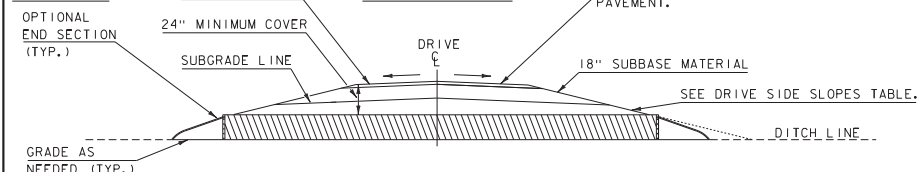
DETAIL C PROFILE OF DRIVE INTERSECTION (FILL SECTION)
